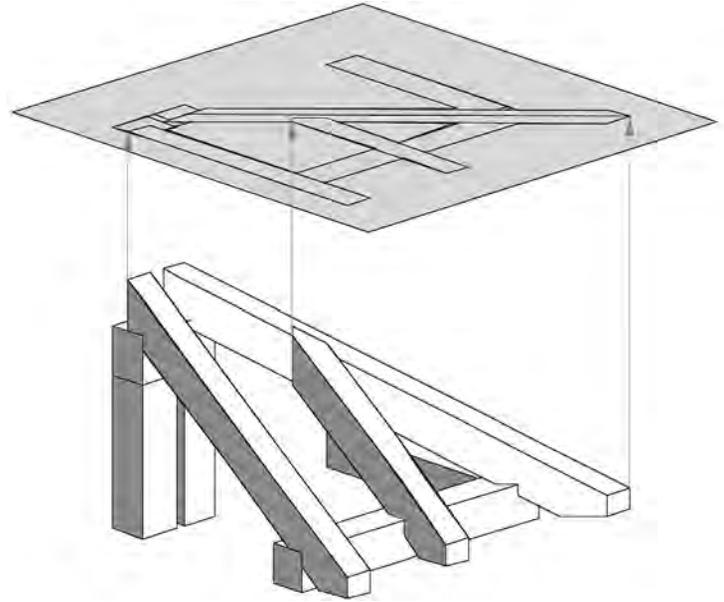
Isometric view of hip model projected onto plan view. For stability, the model is built with two posts under the ridge.
